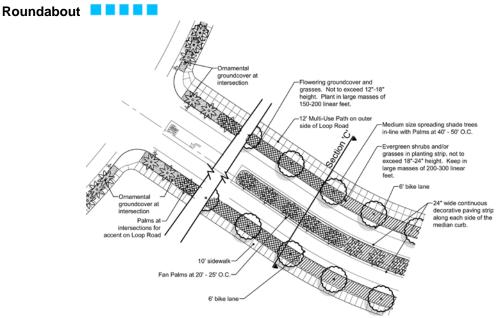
'C' Street - Loop Road - Plan - Between Connector Road and
